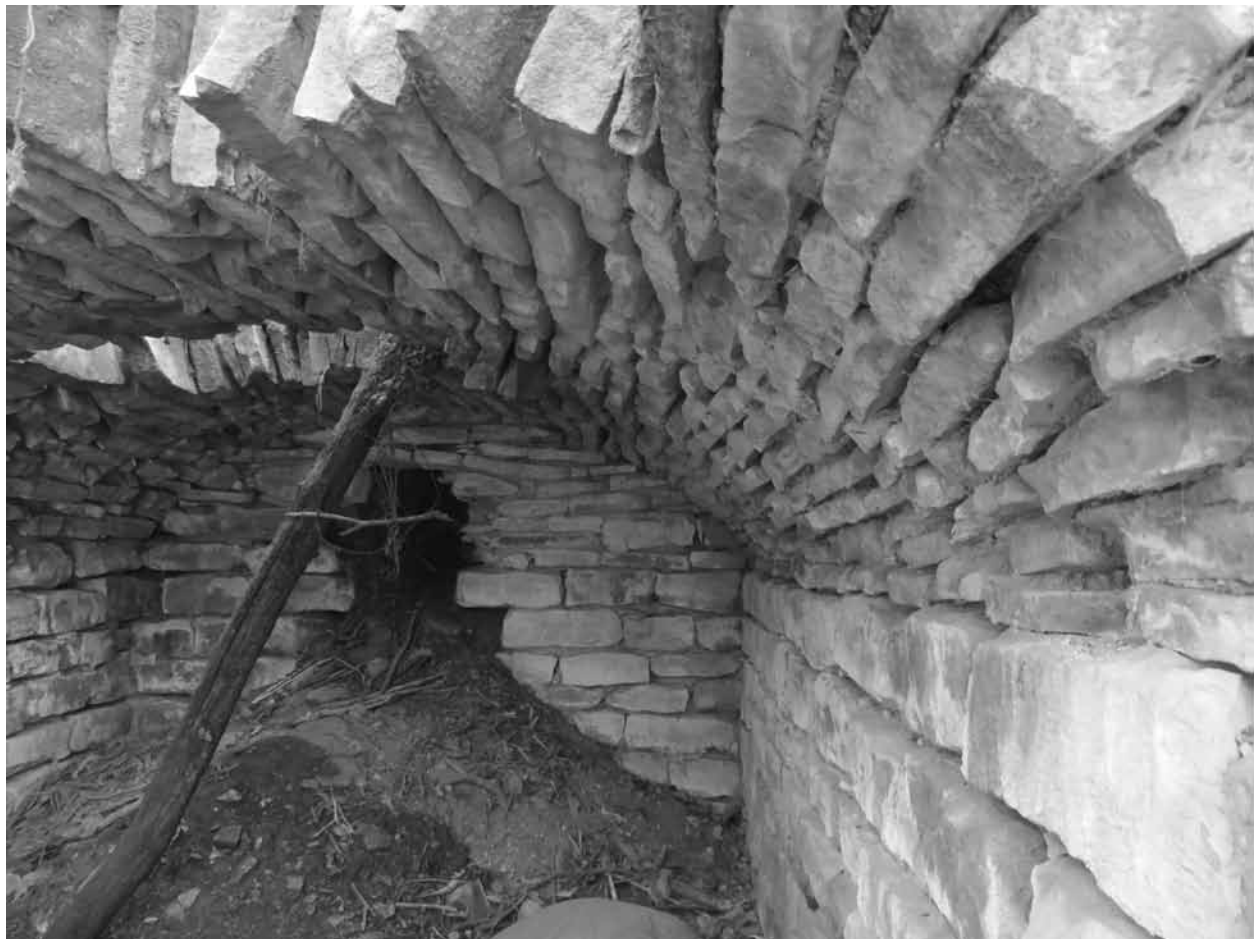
South wall view of Hubbell cave, showing vent, possible fireplace, and partially collapsed ceiling.
